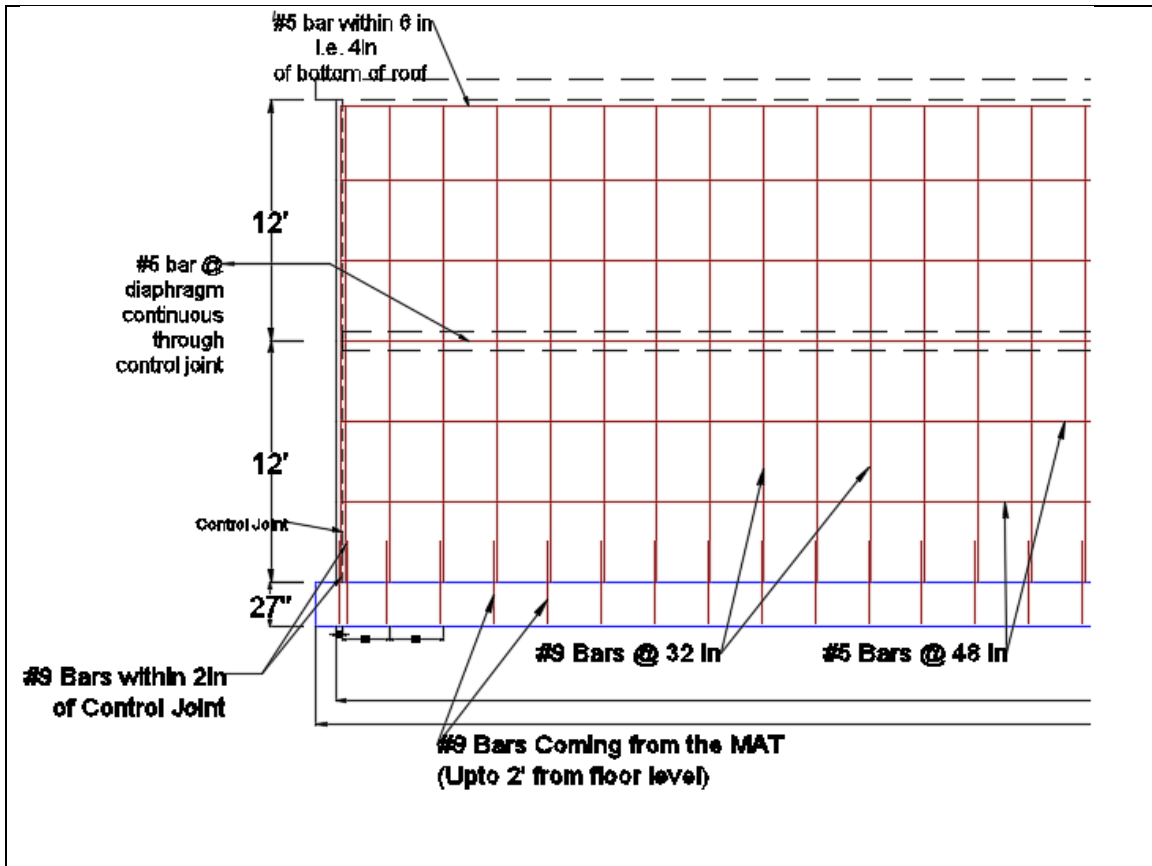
Reinforcement Detailing for Partially Grouted Reinforced Masonry Wall (Portion of the front view)
